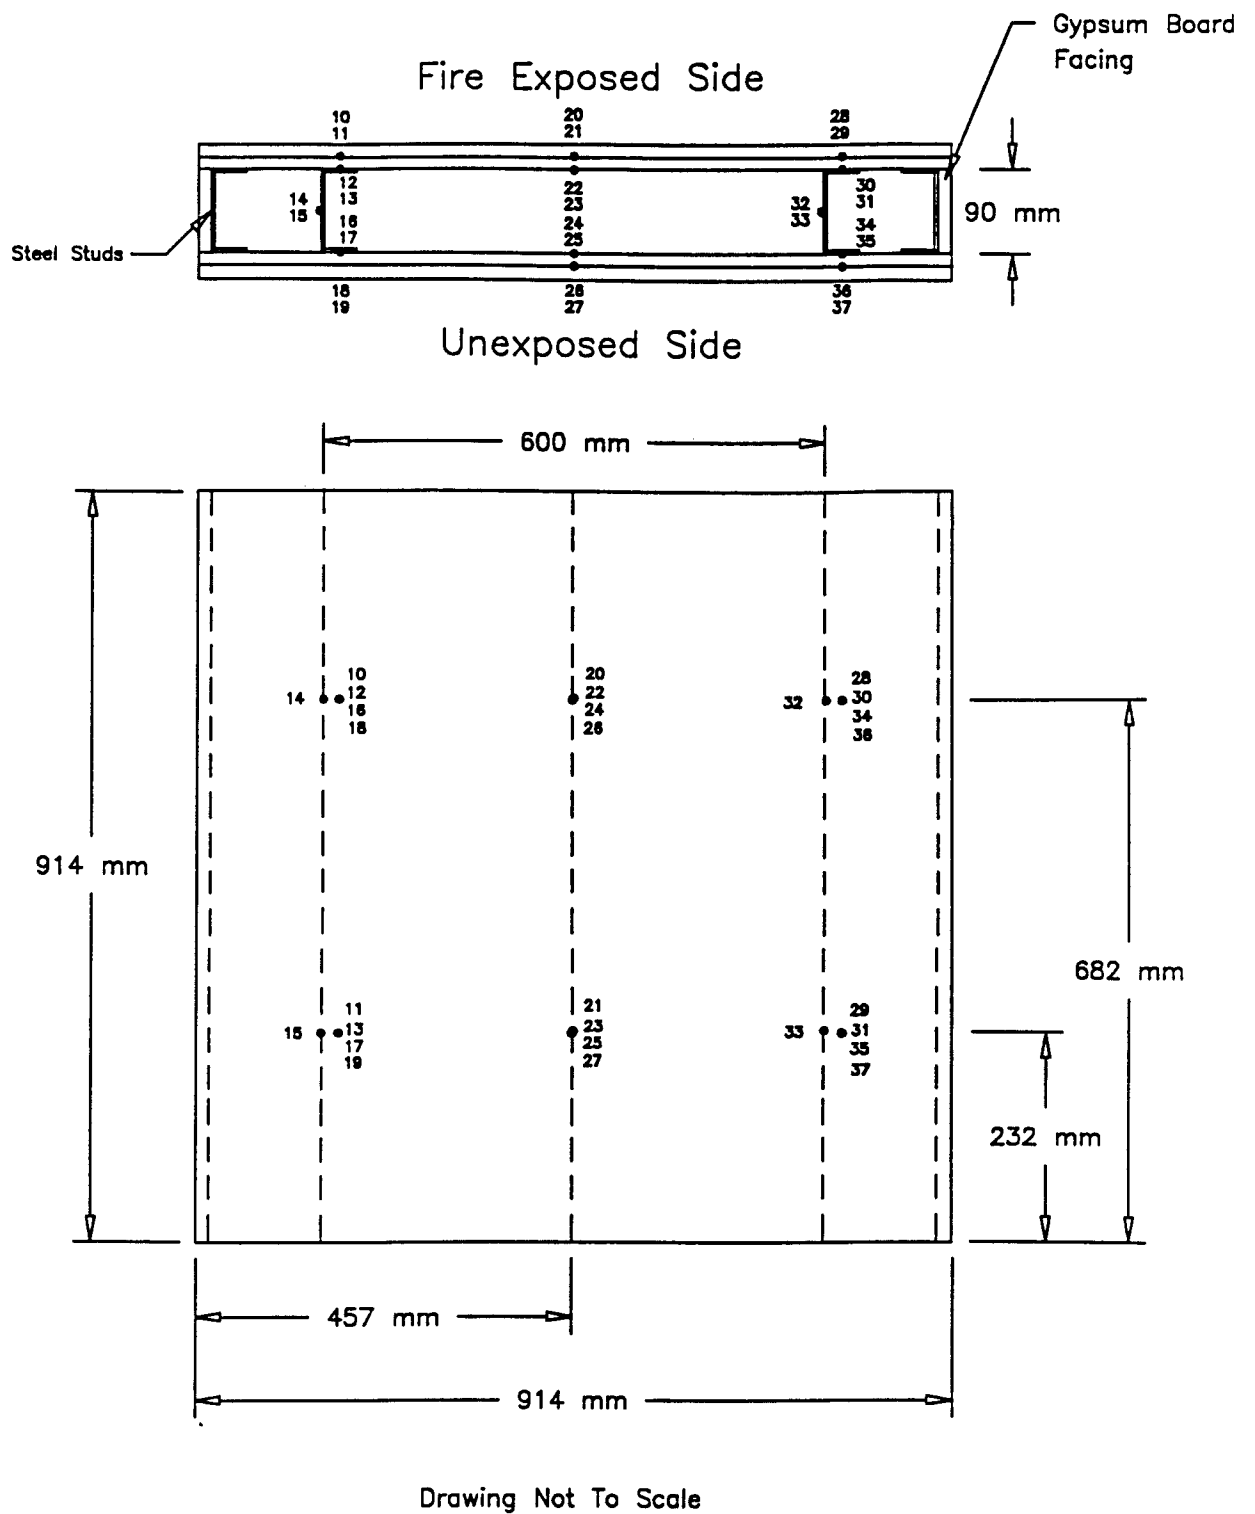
Thermocouple Locations in Small-Scale Test S-01B and S-01C
